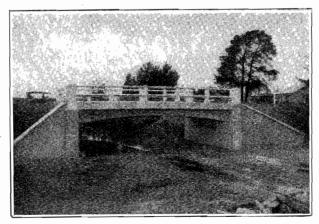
Toomuc Creek bridge, near Pakenham, Prince's Highway East, Section 1. Single-span rigid frame construction.
